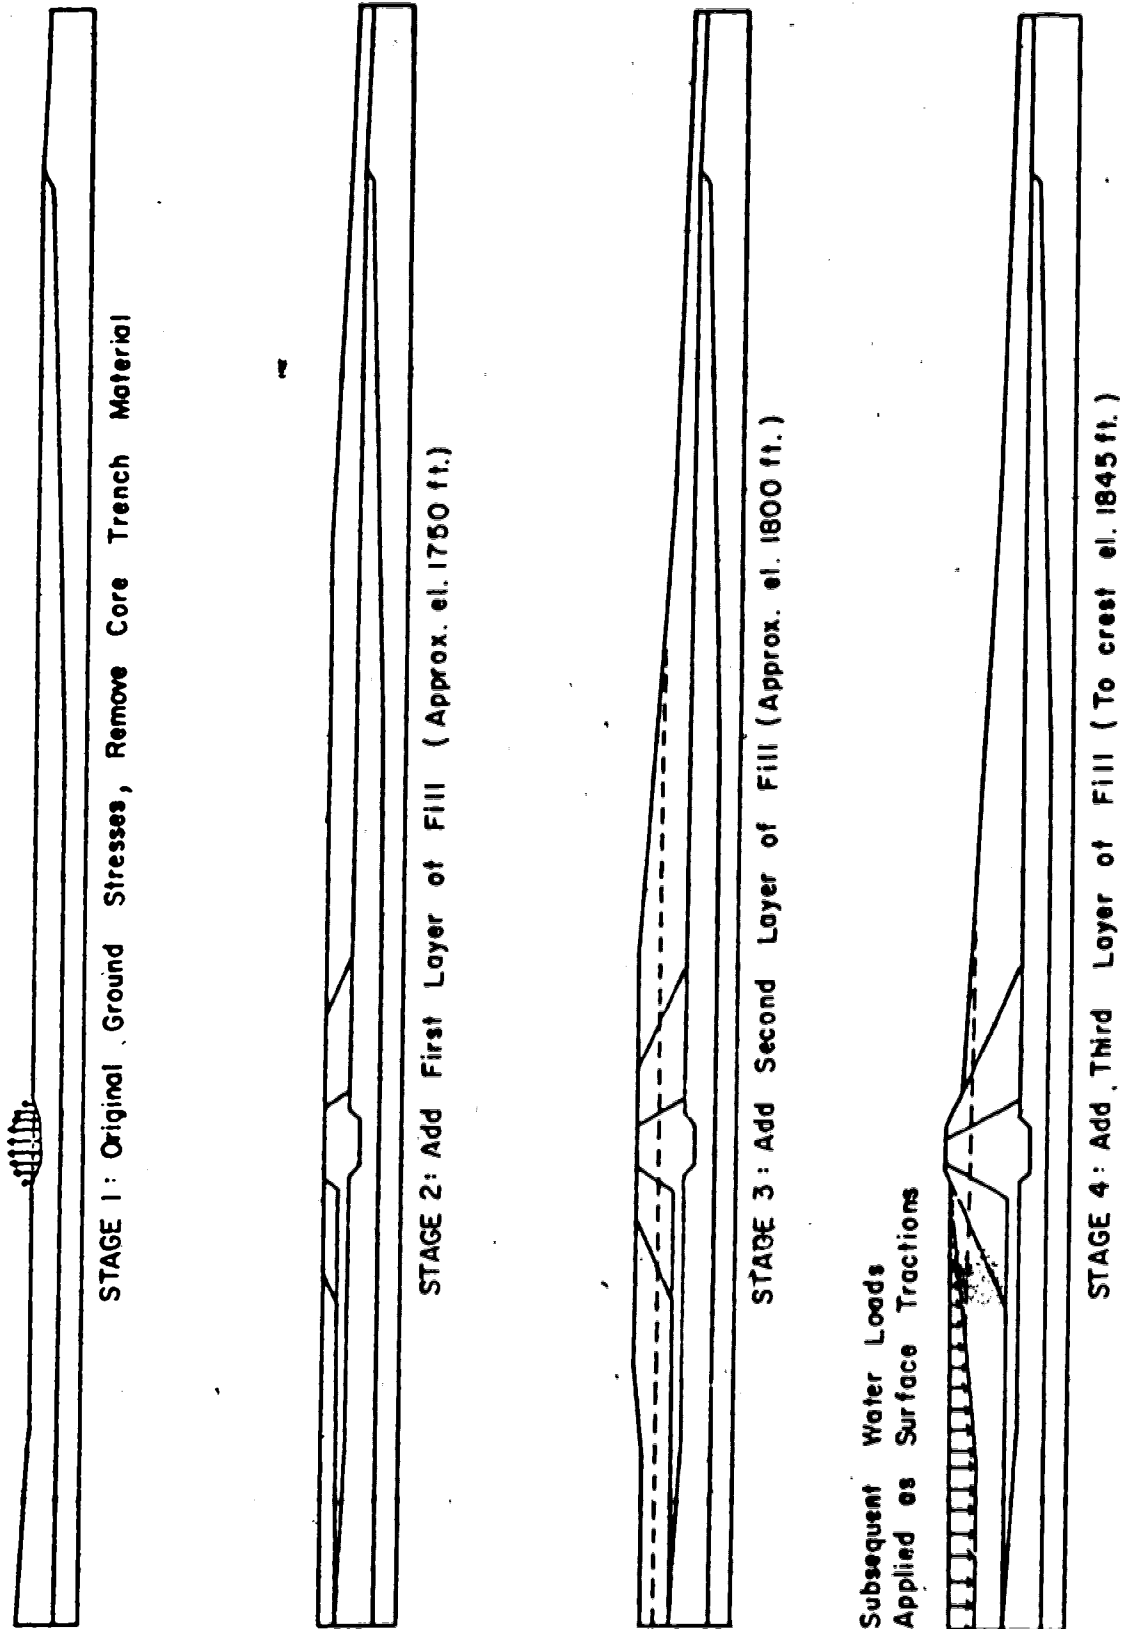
CONSTRUCTION LOADING PROCEDURE.
